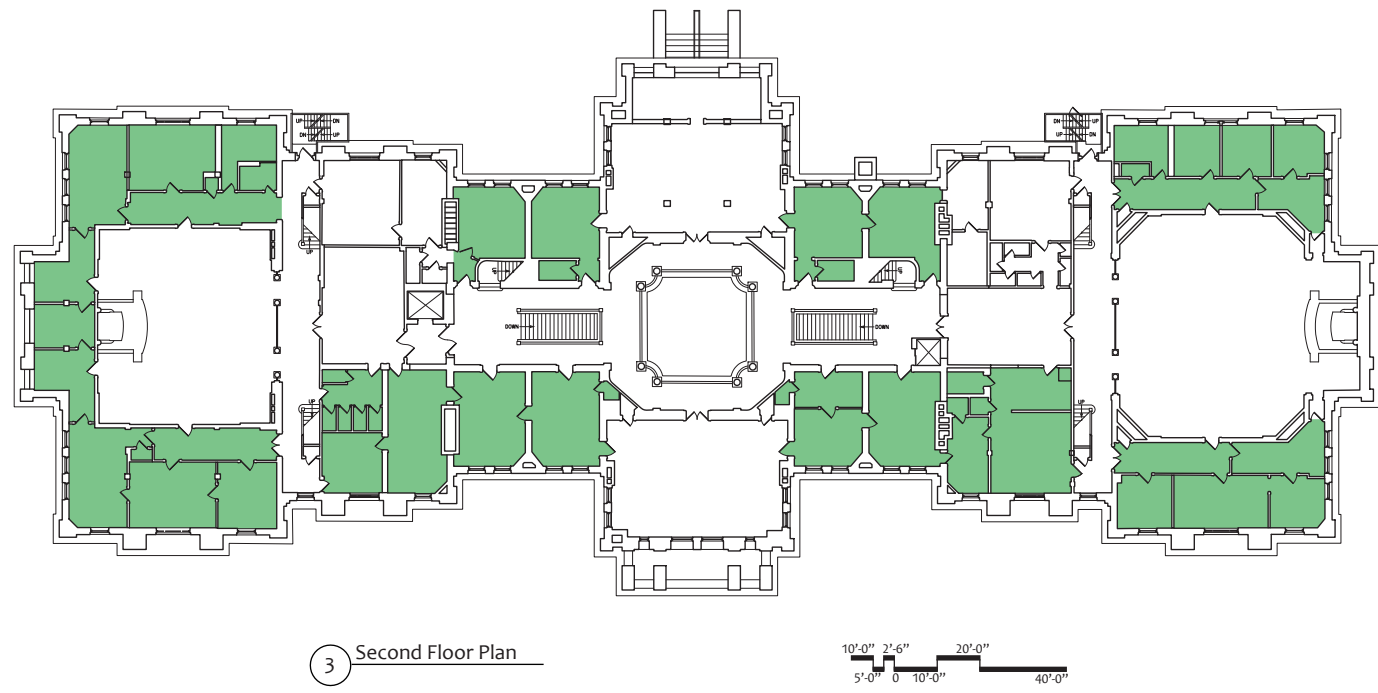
Second Floor Plan [Office Suites highlighted in green]
